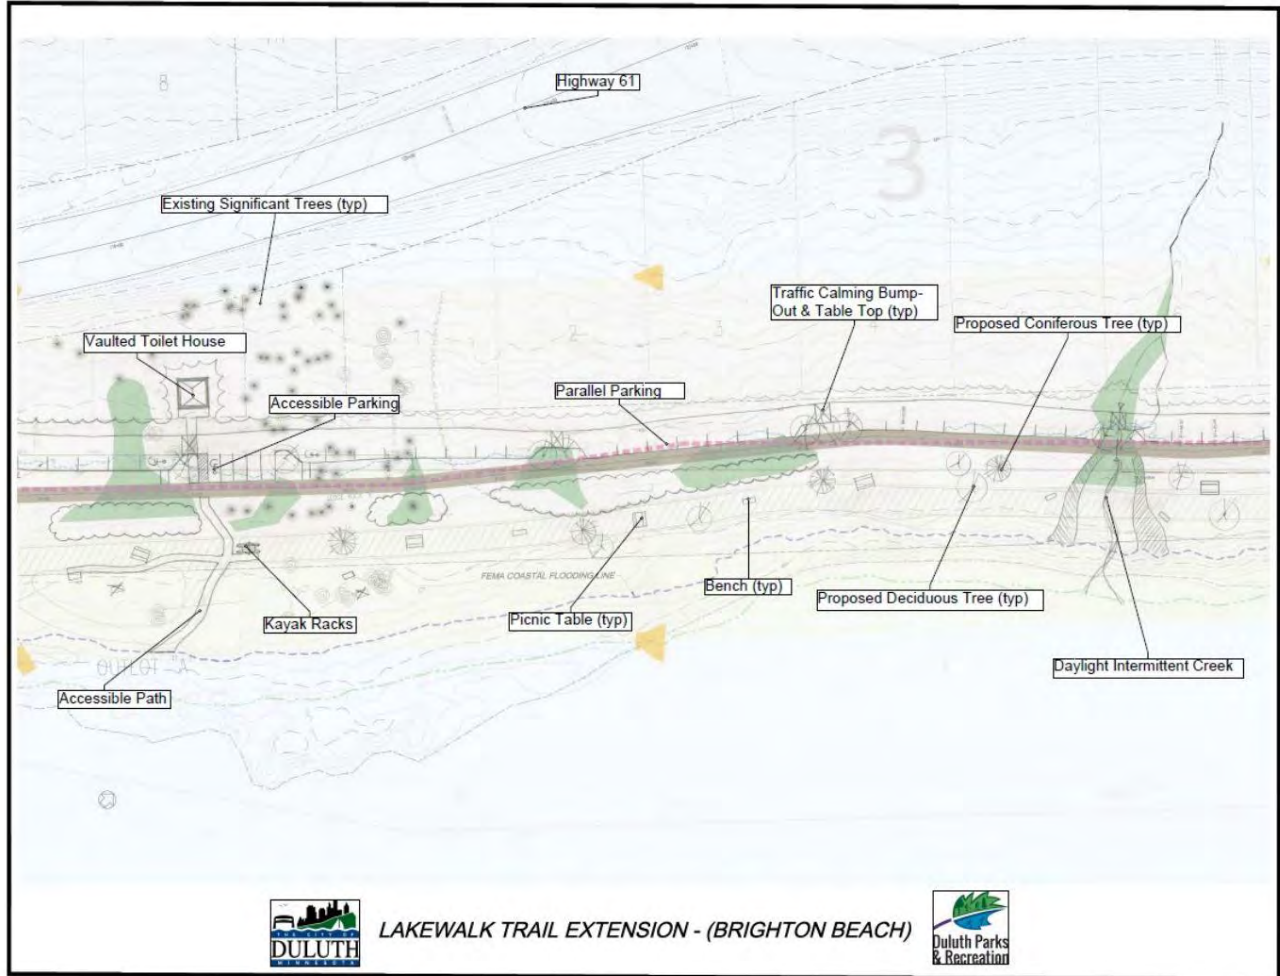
Preliminary proposed landscape and amenity plan, view of Kitchi Gammi Park and Brighton Beach, with new parking and other amenities.
